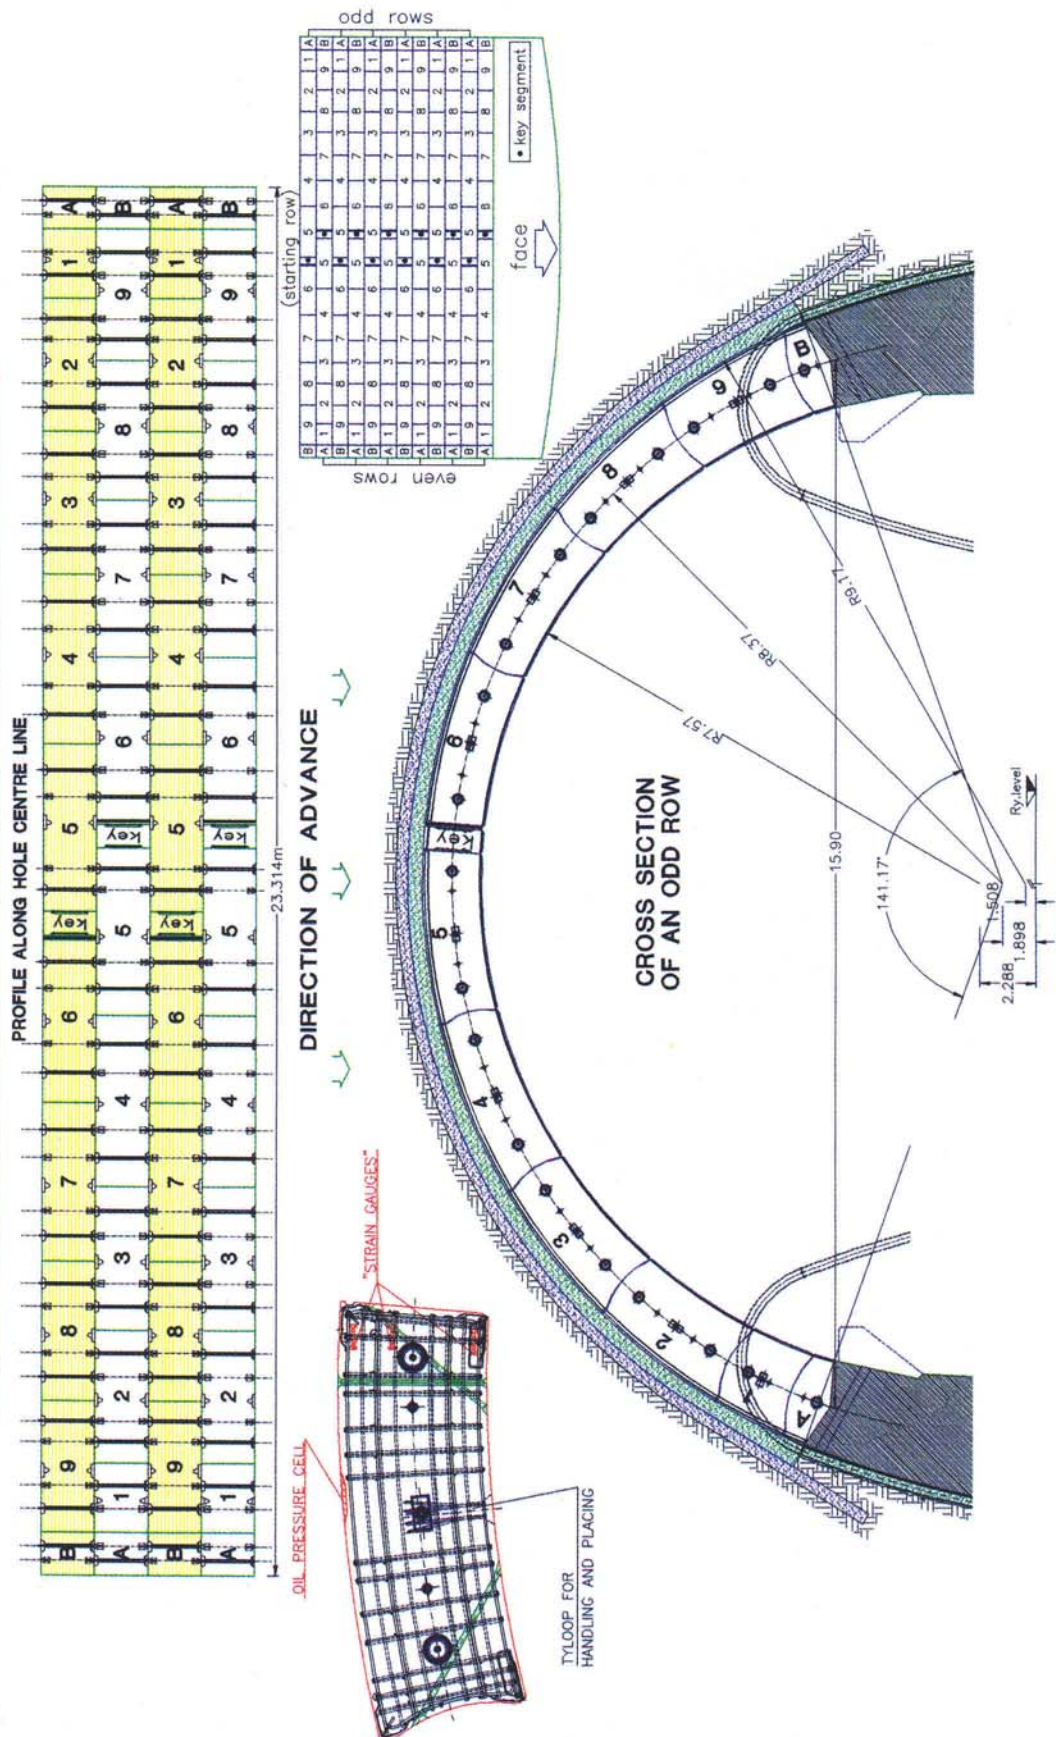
"Baldo degli Ubaldi" Station-Arch Prefabricated Segment Erection
